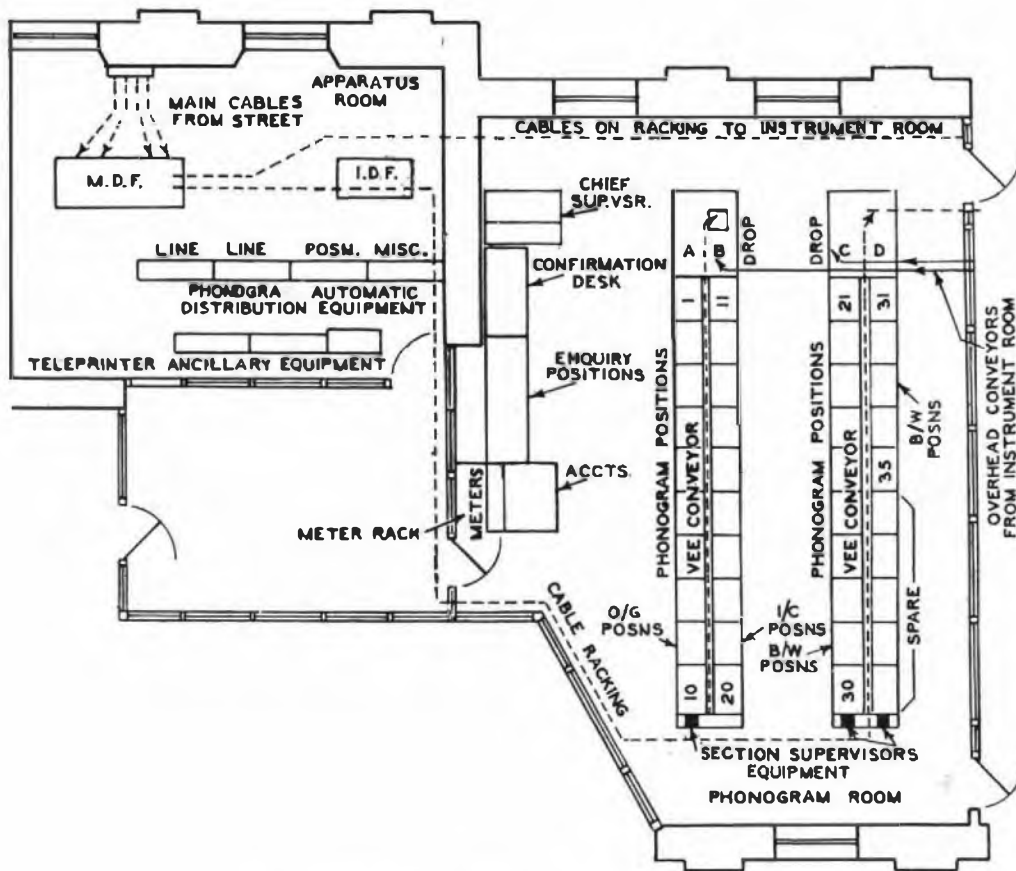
FLOOR PLAN OF FIELD TRIAL EQUIPMENT AT NEWCASTLE.
